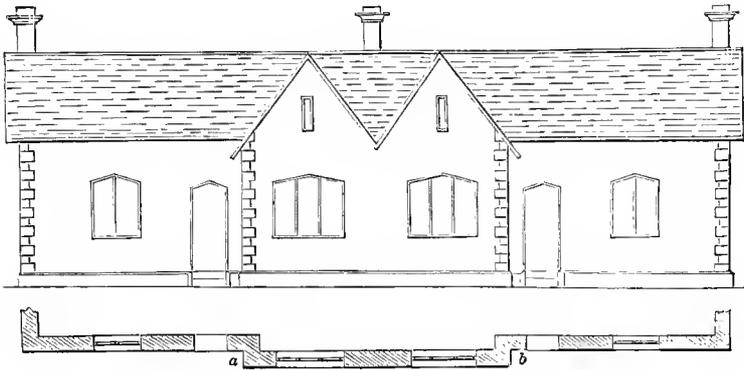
Alternative front elevation to front elevation in fig. 743.
